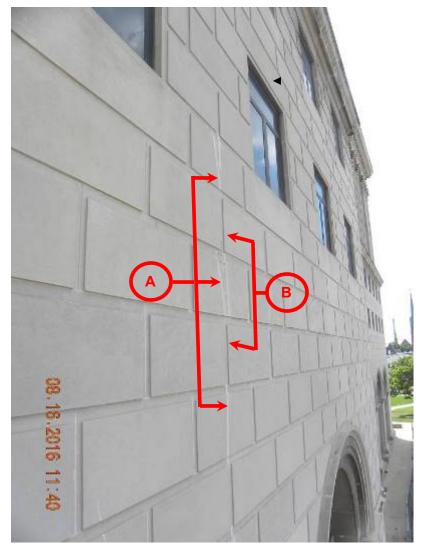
Continuous cracks (A) and separations in vertical mortar joints between cracked units (B) indicate ongoing distress within the walls.
